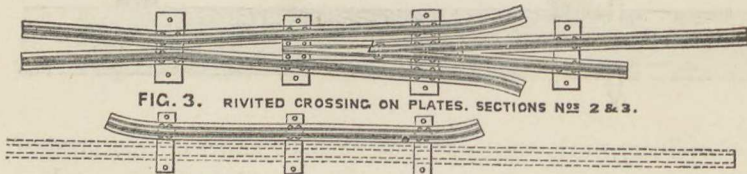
RIVETED CROSSING ON PLATES. SECTIONS N° 2 & 3.
